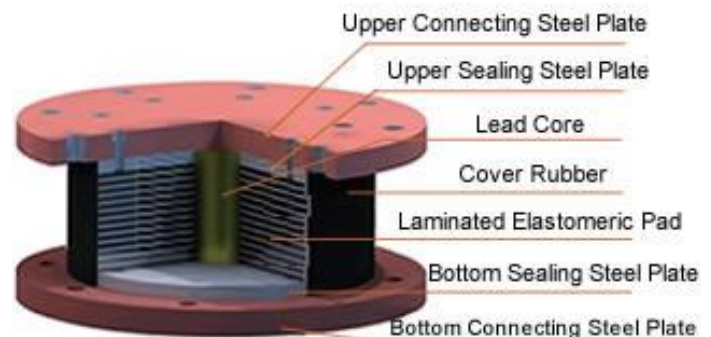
Component of Lead Rubber Bearing (LRB)
